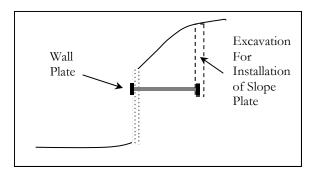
B. Plate anchors require excavation of a vertical hole to connect soil plate to metal rod. Plate surface area proportional to holding strength.
